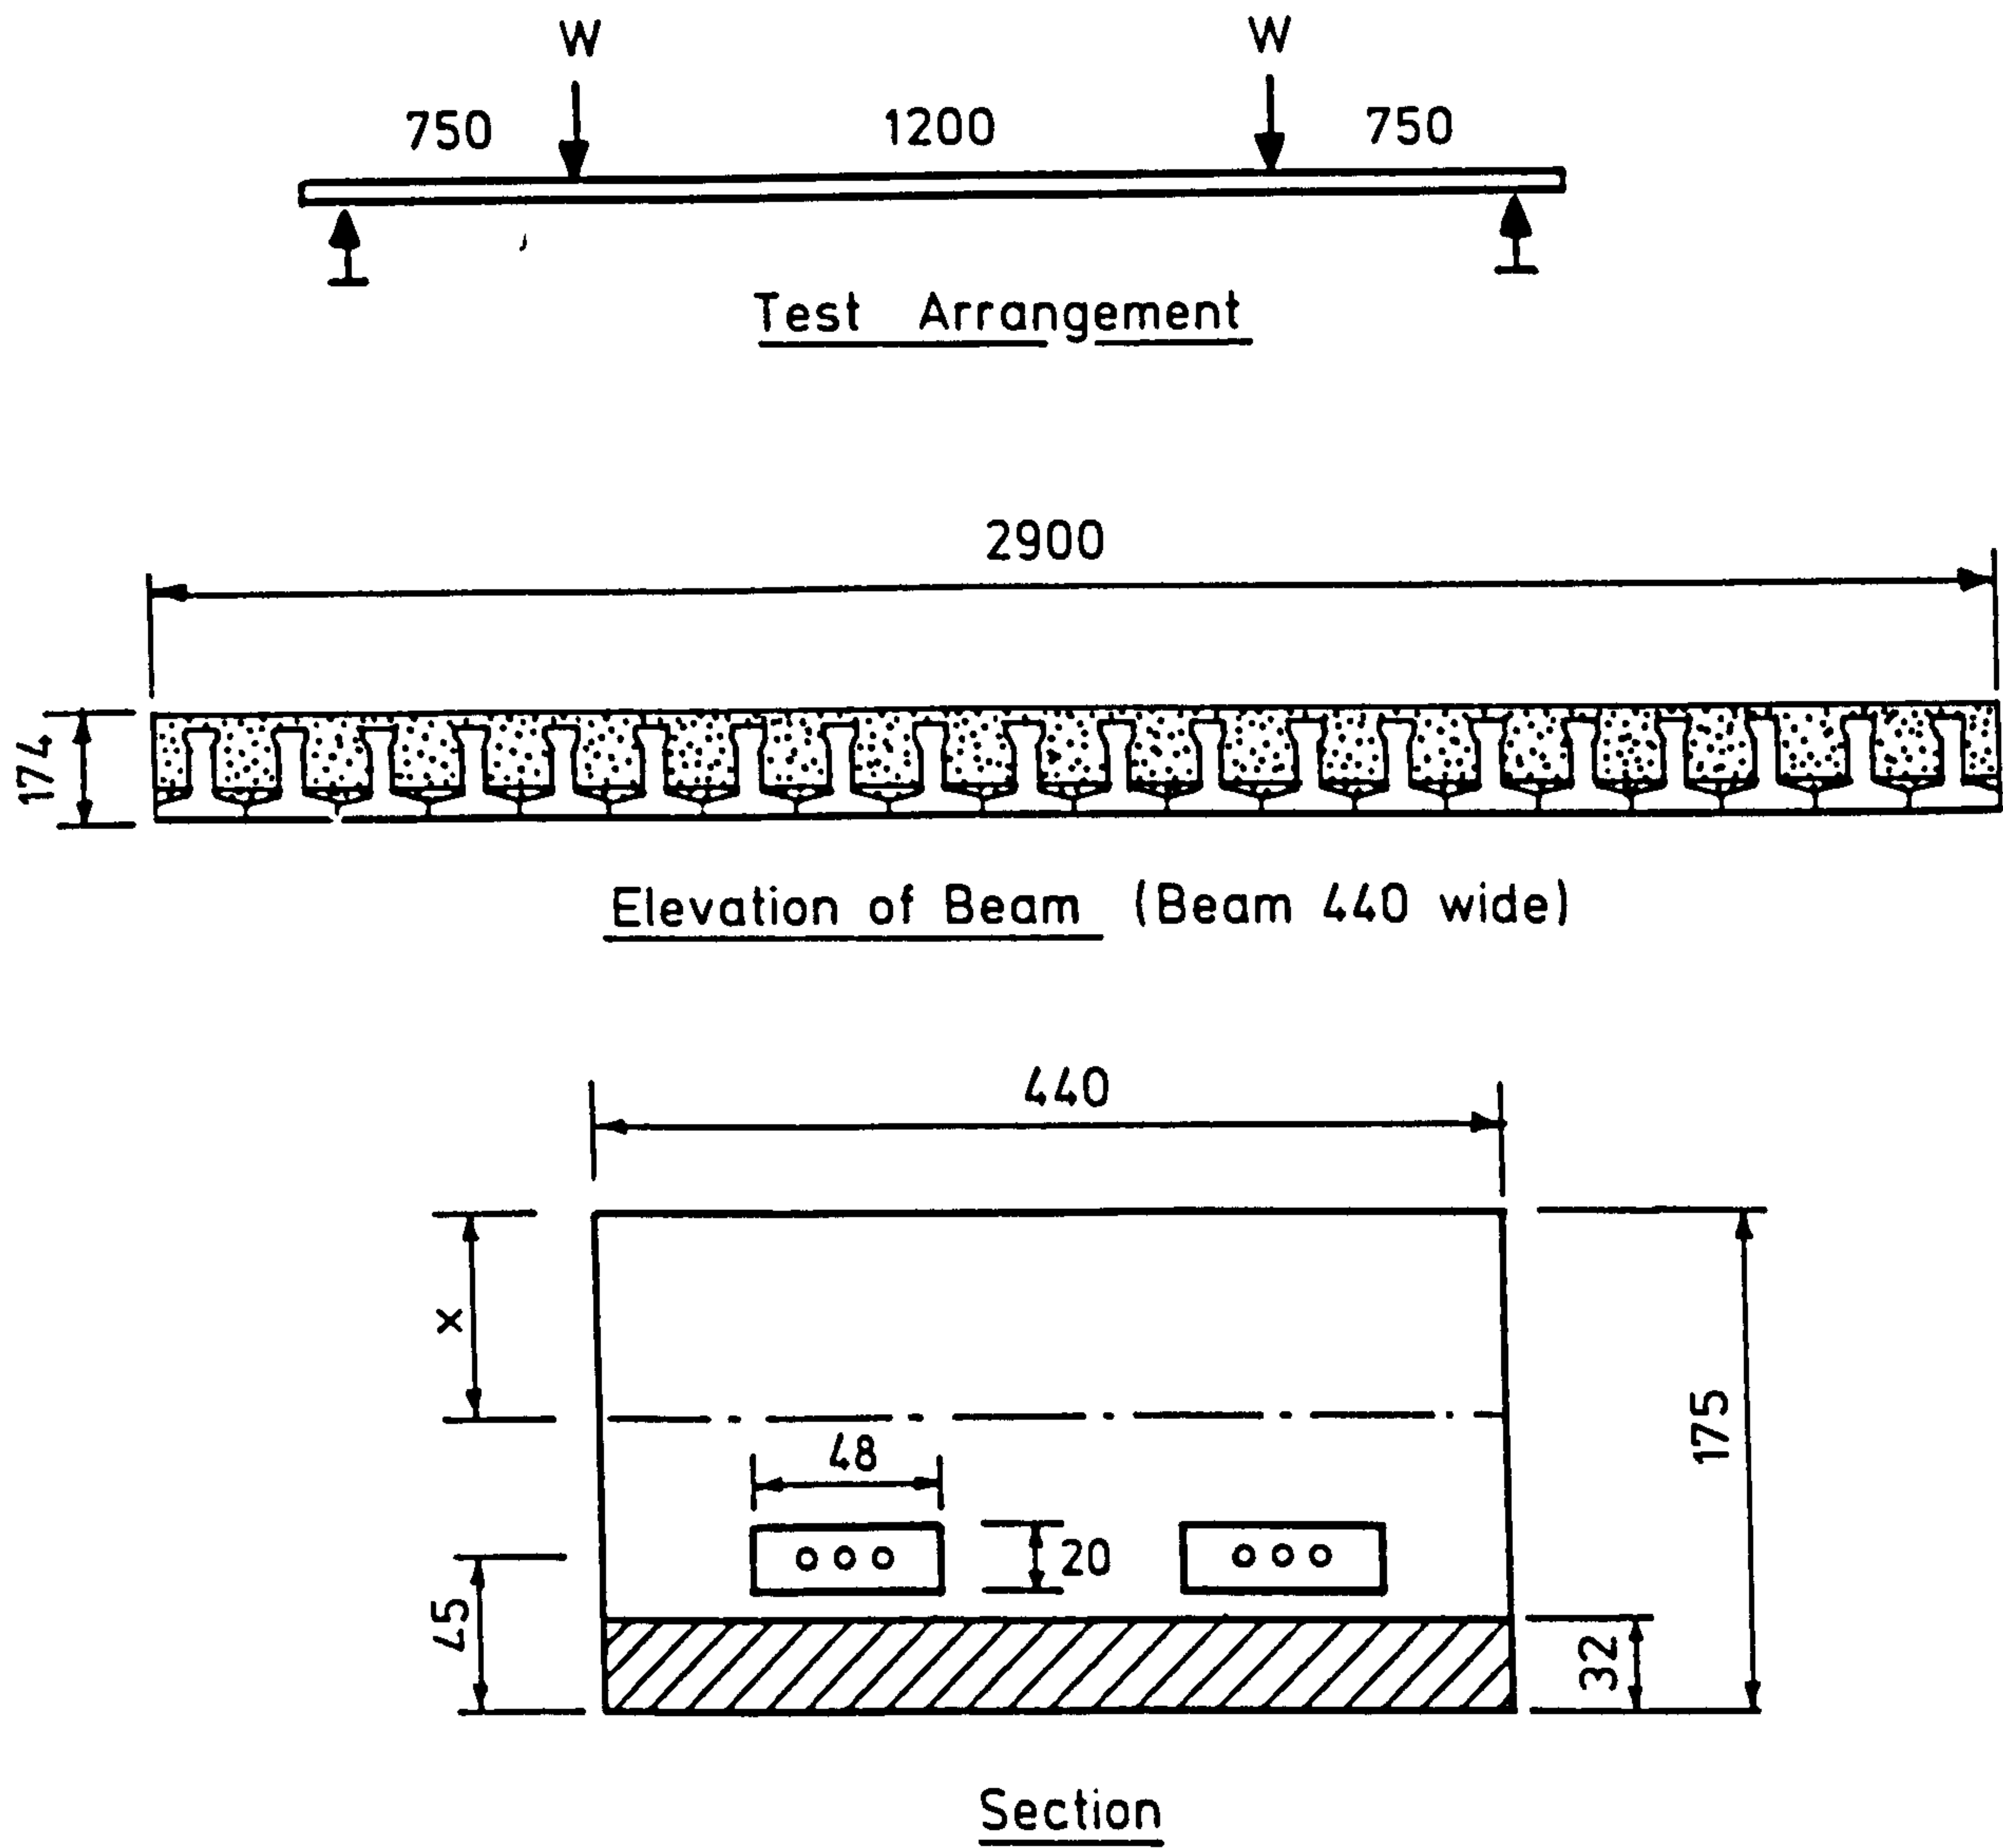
BEAM TEST ON TRANSVERSE SECTION
